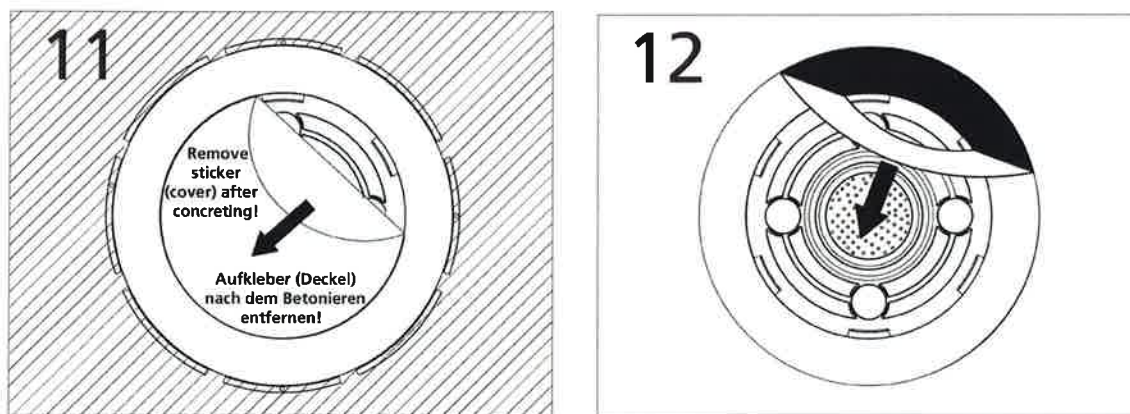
Removal of the sticker at the cover (left) and the frame (right) of the tundish (manufacturer's drawing).
